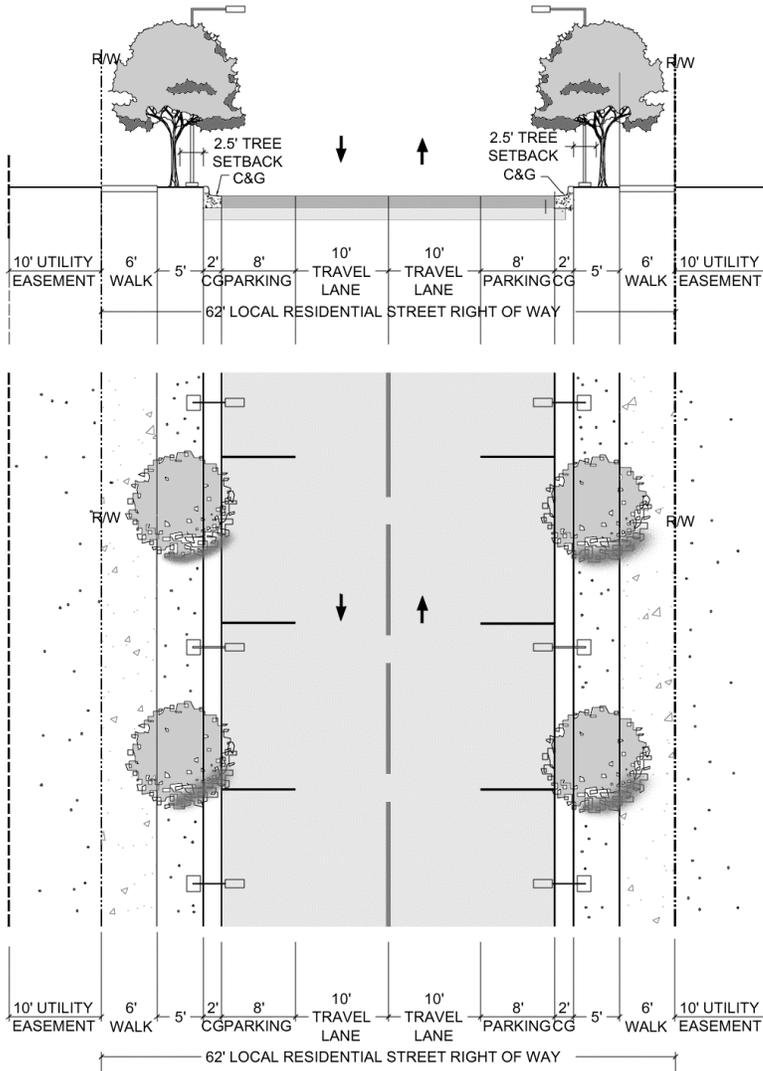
Local Residential Street 62' Right-of-Way Cross-Section
